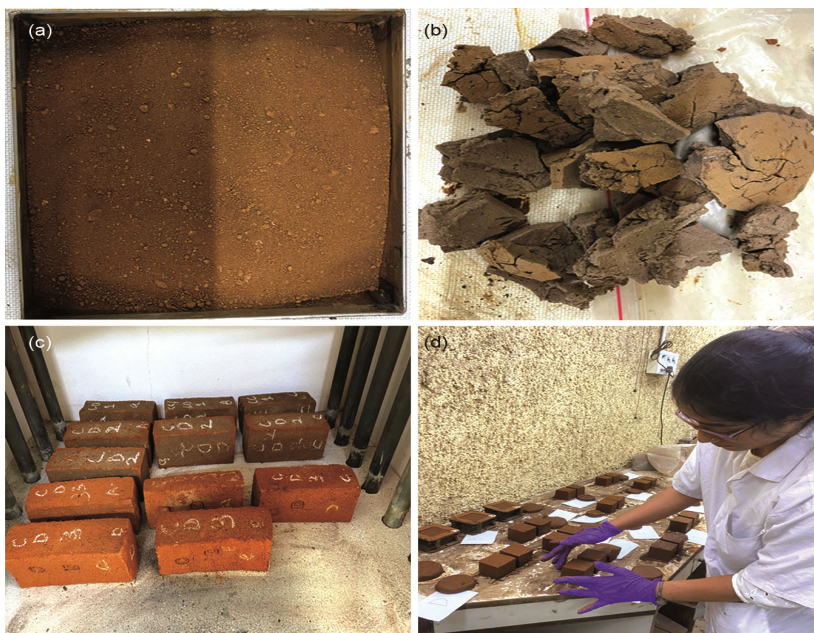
(a) Soil used in brickmaking, (b) Dried drinking water sludge, (c) Fired bricks inside furnace and (d) Making of hand moulded bricks.
